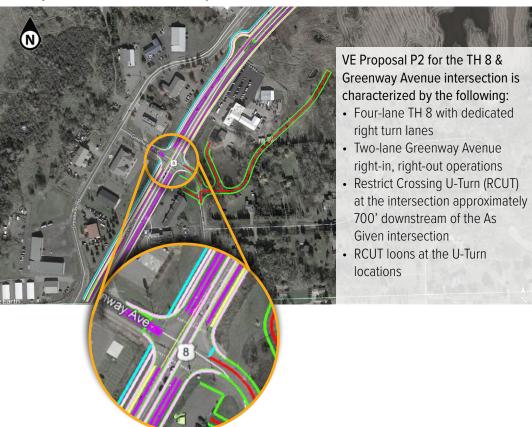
VE Proposal P2 - TH 8 & Greenway Avenue intersection
